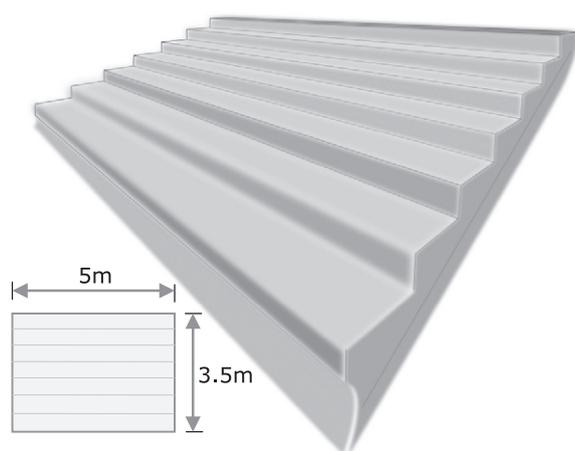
Precast revetment armour unit, designed to protect the revetment.
